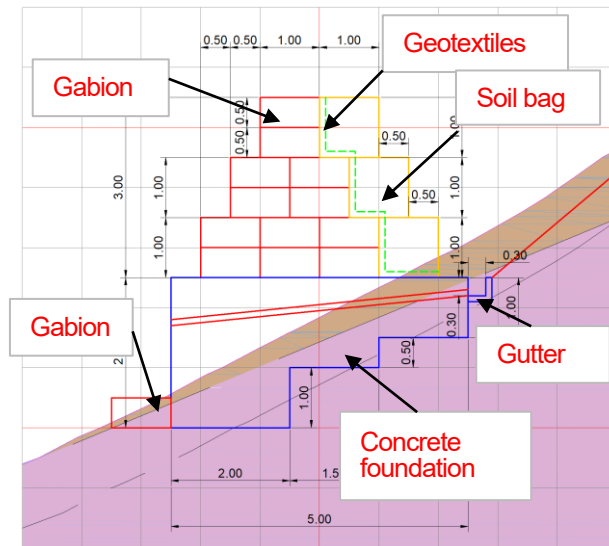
Case study of rockfall protection wall in Honduras (Fuerzas Unidas)
